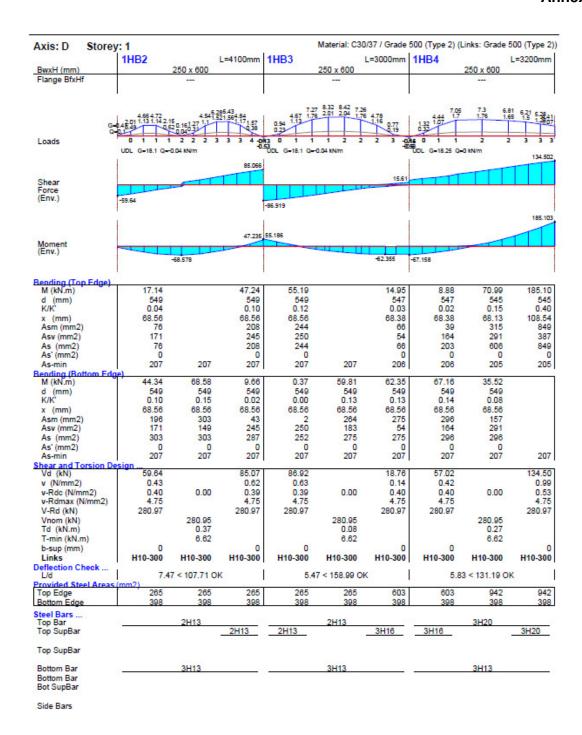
Beam analysis and design with beam markings (same as structural plan) shown in design calculation
